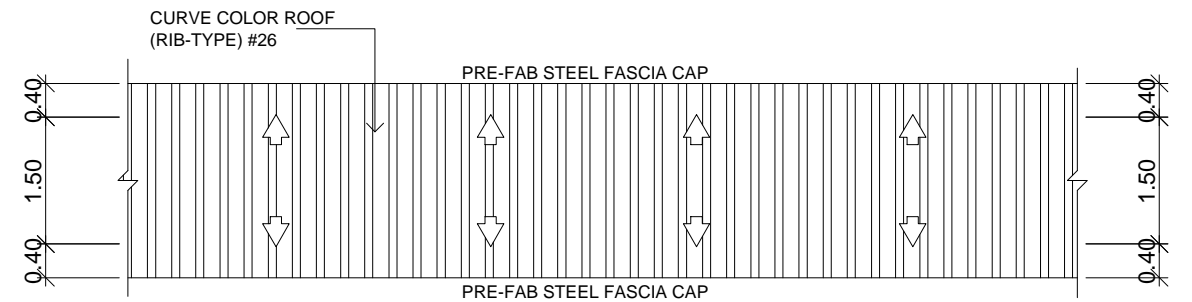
DETAIL "B" TYPICAL COVERED WALK SECTION DETAILS
